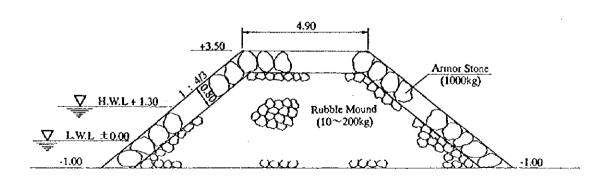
Typical Cross Section of Groin (Rubble Mound with Armor Stone)
